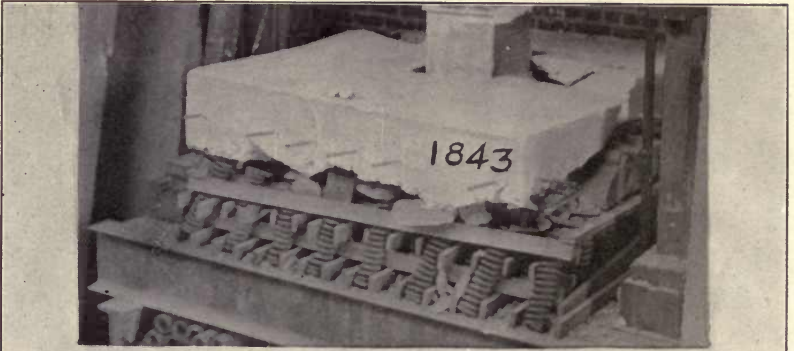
VIEWS SHOWING COLUMN FOOTINGS AFTER FAILURE.
